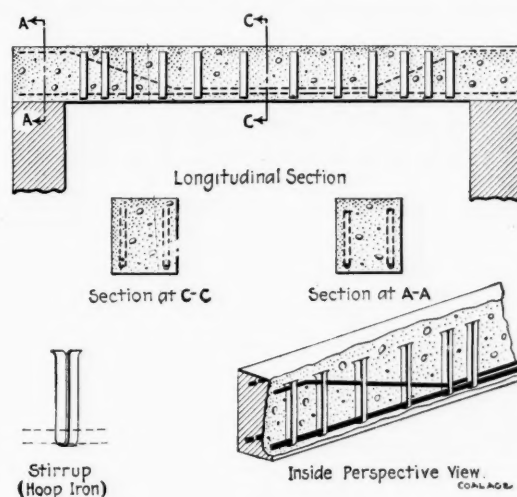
COLLARS ARE REINFORCED LIKE BEAMS IN BUILDING CONSTRUCTION
